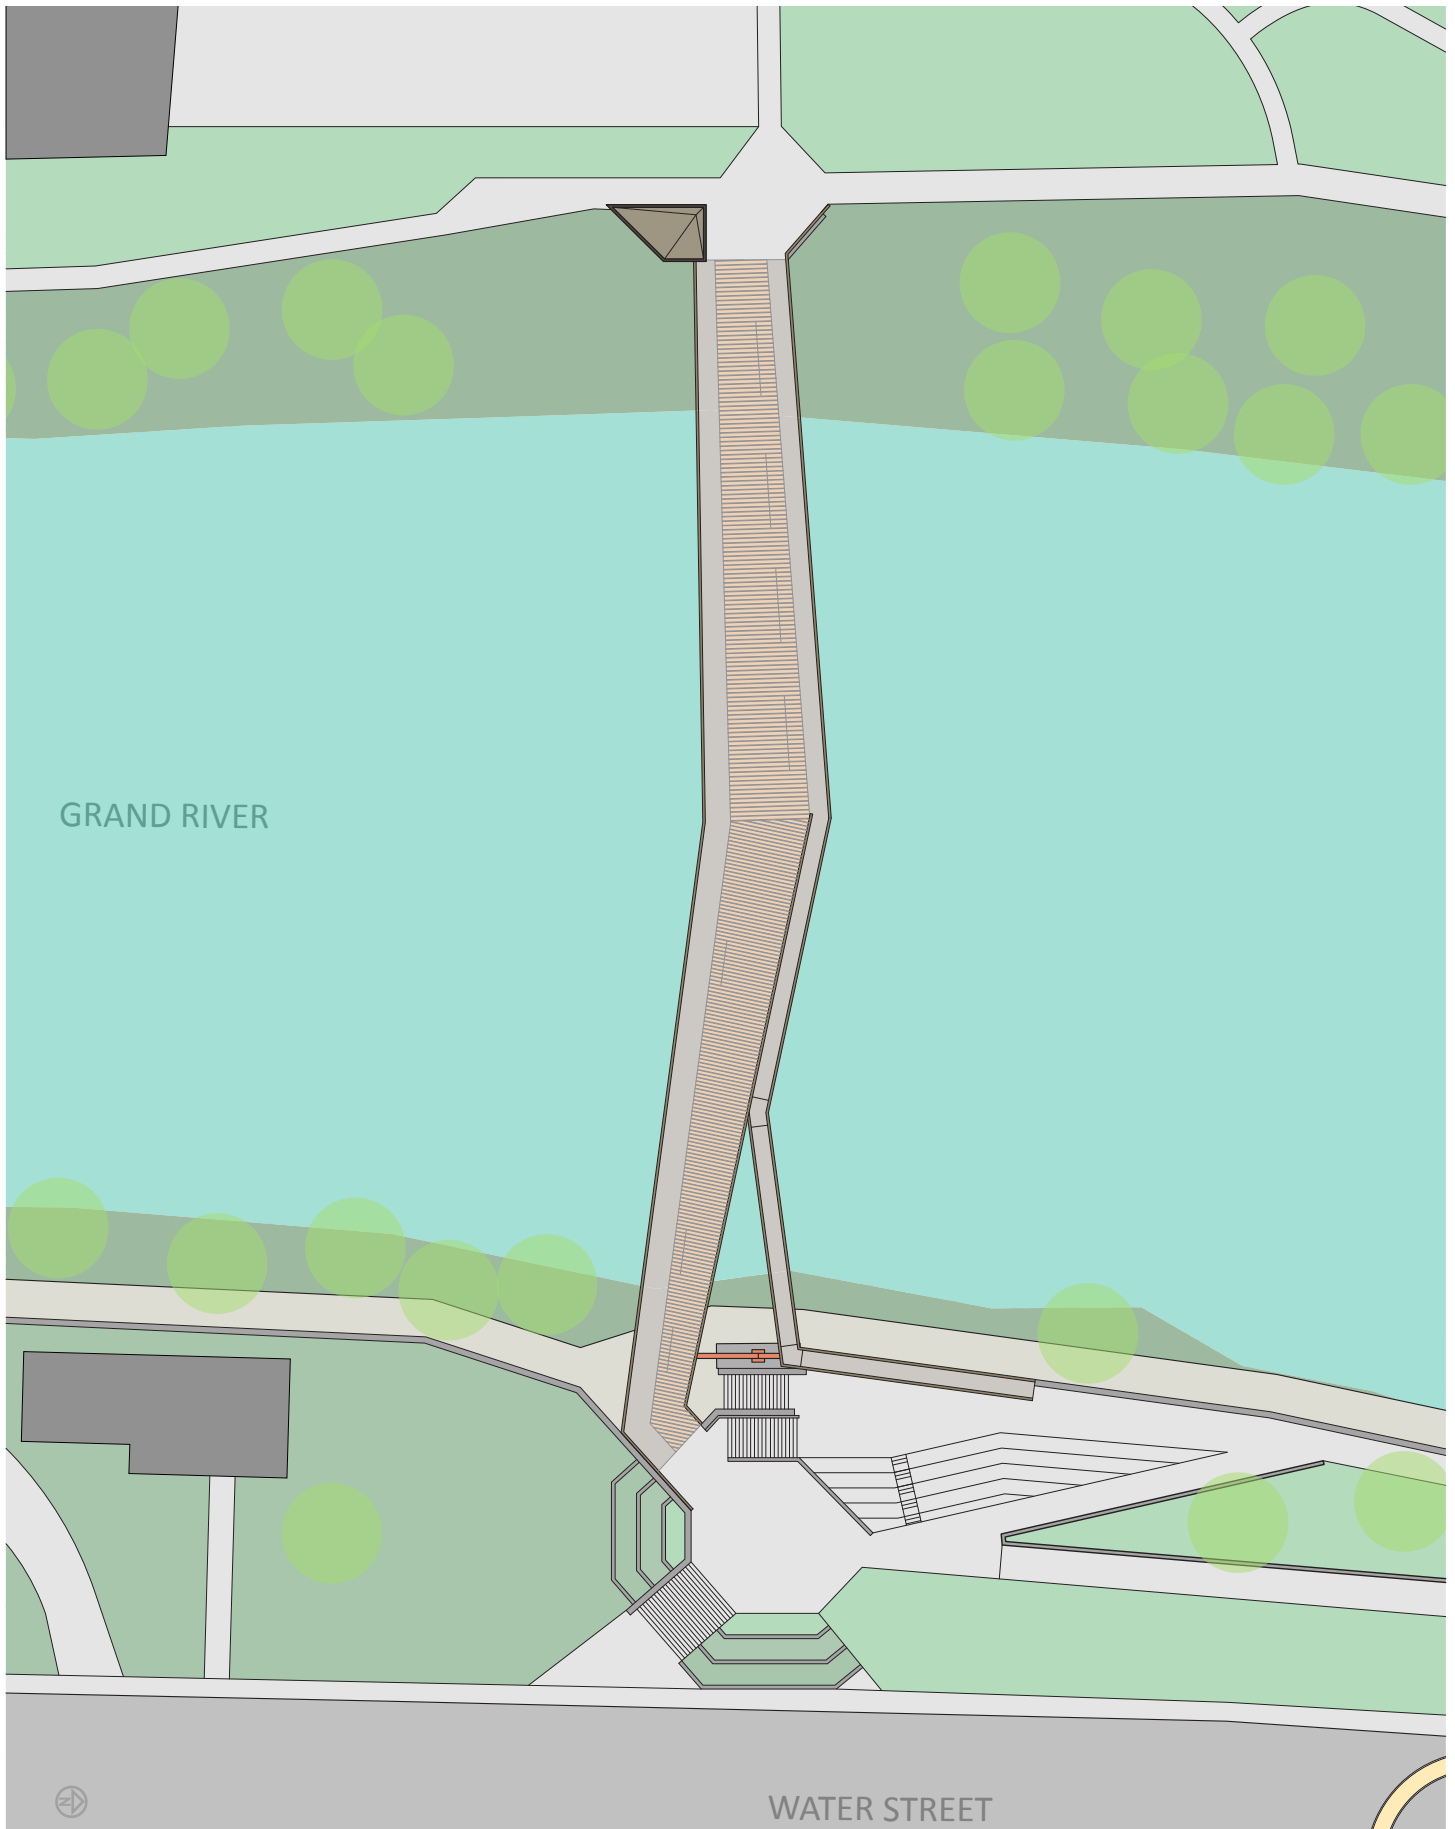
Siteplan for the Market Bridge (1:600).
